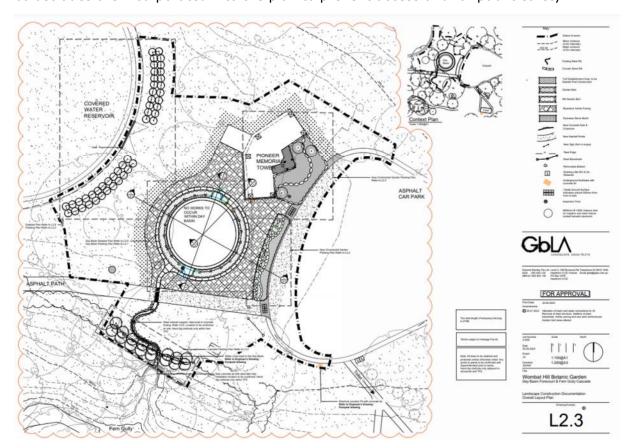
Site plan of the proposed development, GbLA drawing L2.3. (Source: GbLA, 2023)
